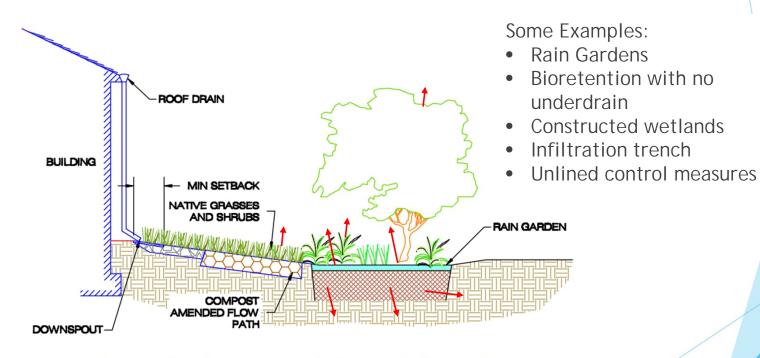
Rooftop Disconnection – Section View: Simple disconnection to downstream bioretention (Source: VADCR, 2011).
